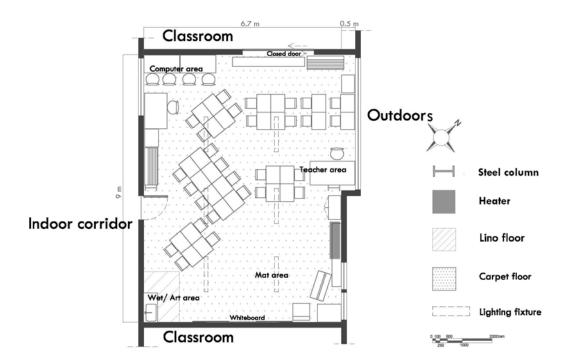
ROSENEATH CLASSROOM'S FLOOR PLAN.
